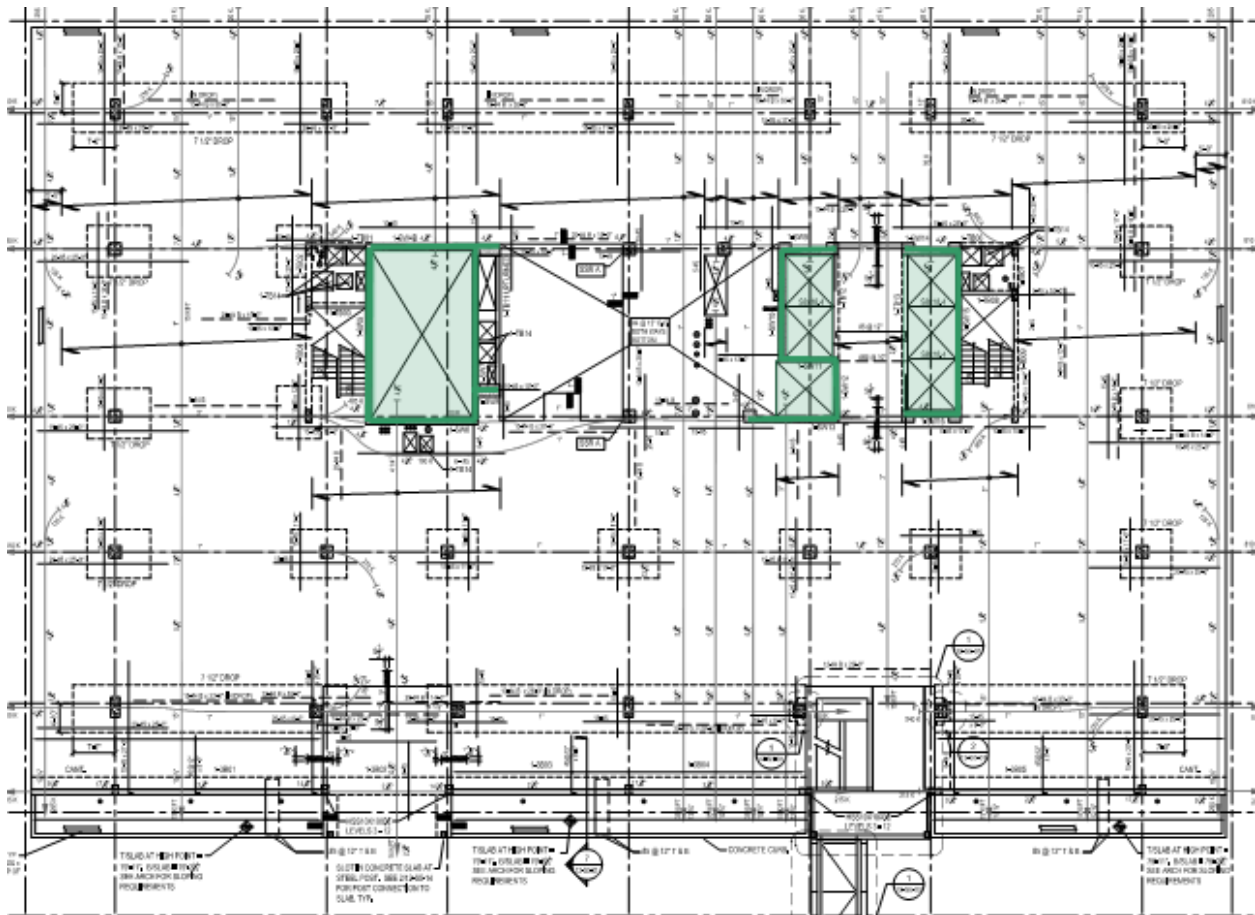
Plan view of the lateral system with shear walls shown in dark green.
